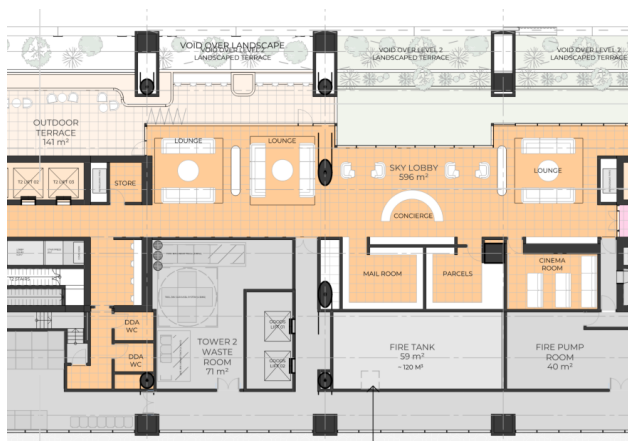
Originally submitted Level 3 Plan (Source: Woods Bagot)
